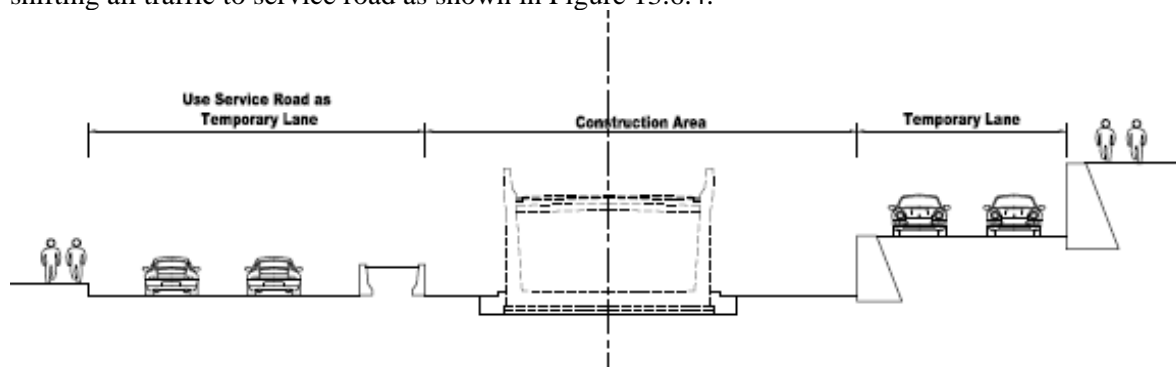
Lane Arrangement During Construction in Arniko Highway
